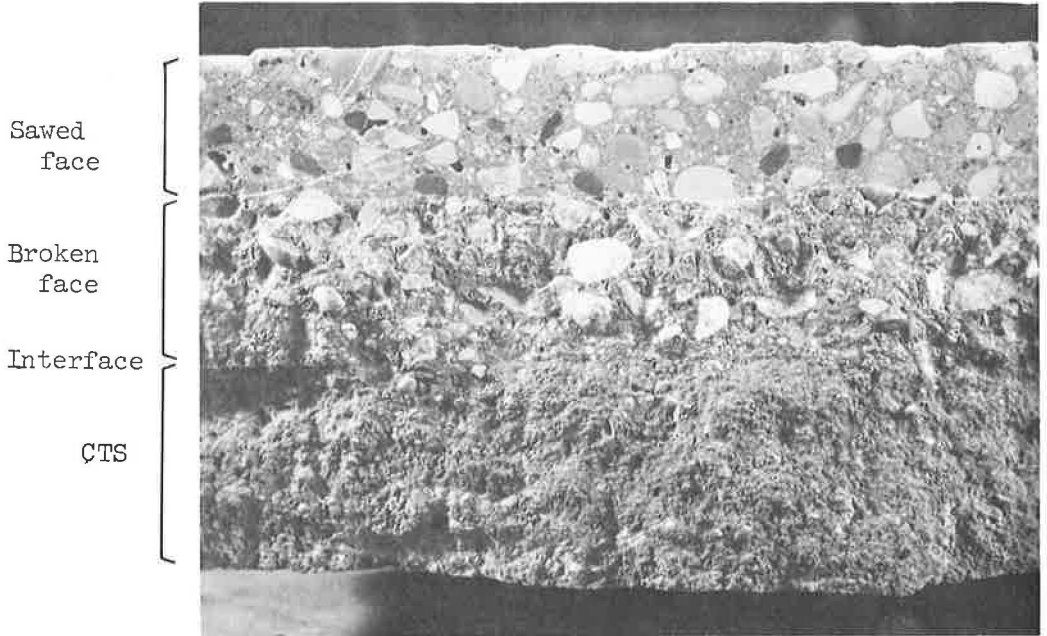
Efficacy of bond between concrete and cement-treated subbase.
